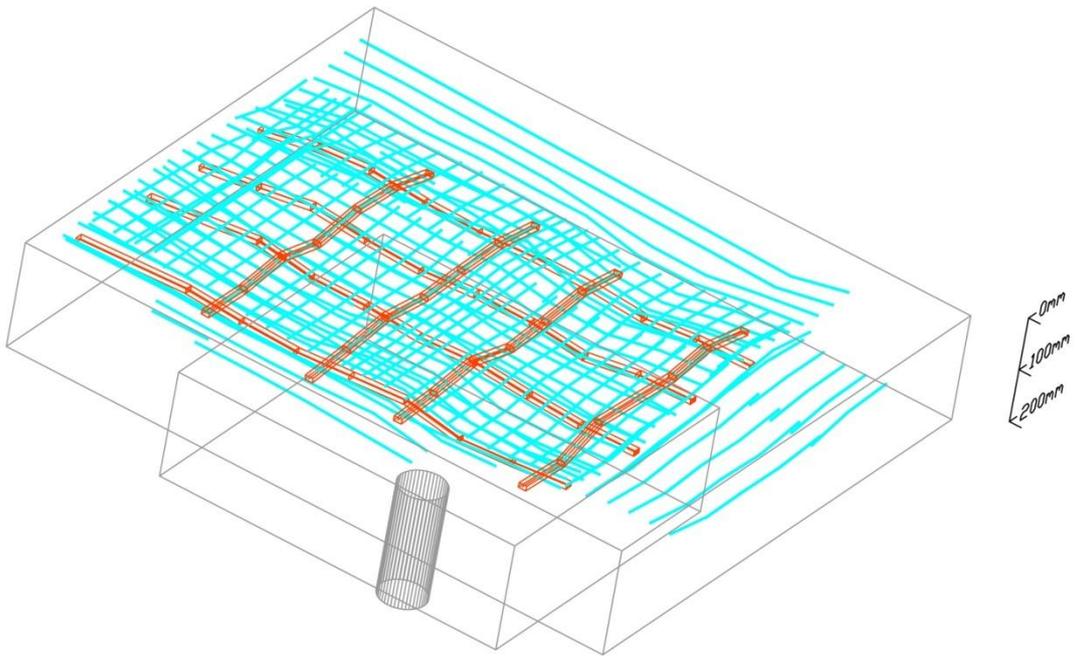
3D view from downward perspective view showing PT duct layout and reinforcement detail
